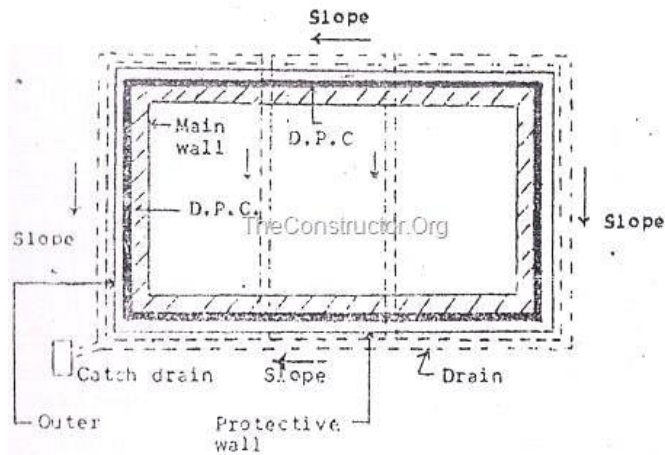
to 3.8 explain provision of damp proof course under different conditions
